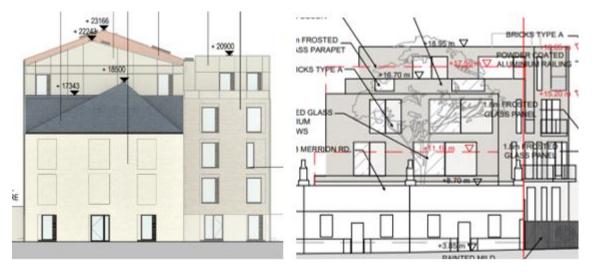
North/ East elevation facing the protected structures, proposed to the left and permitted to the right
